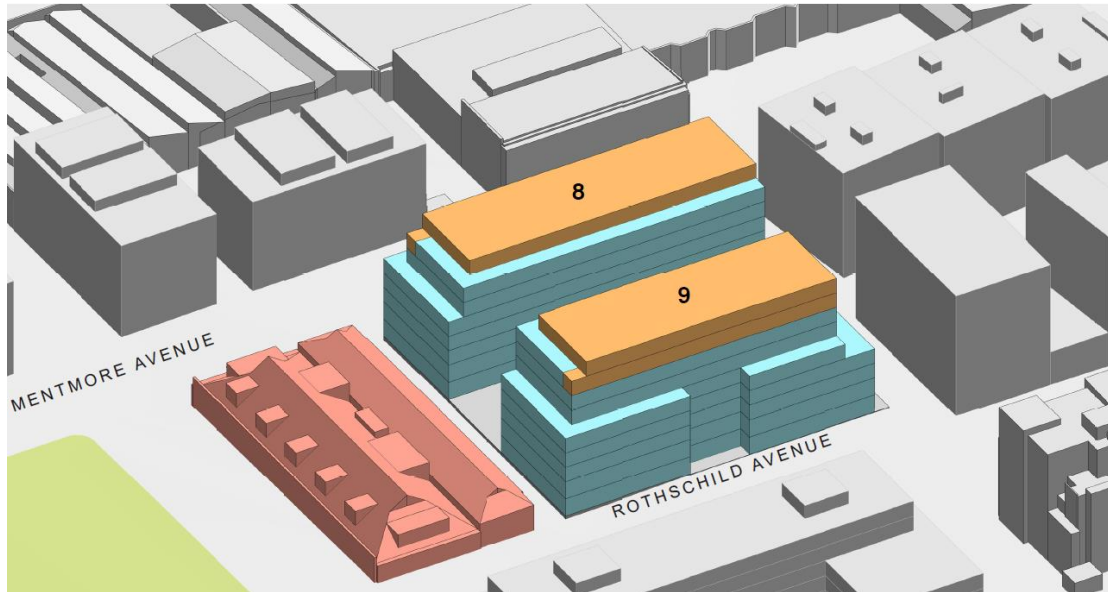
XX: Rothschild Avenue elevation and upper level setbacks to the through-site link and heritage curtilage
